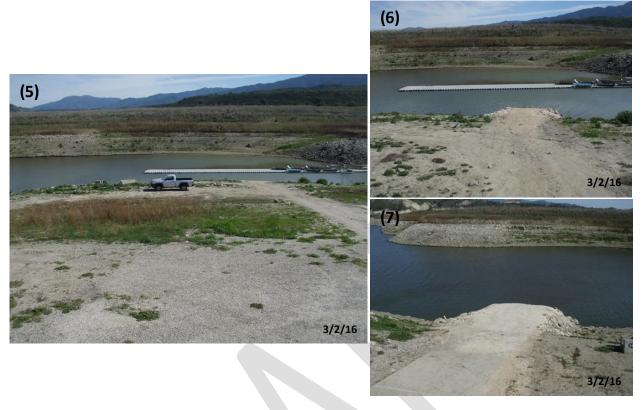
County Park boat ramps at the lowest lake elevation showing where loading of Anchor Piles with a crane onto the construction barge would occur; photo numbers reflect viewpoints shown in Figure 5.
